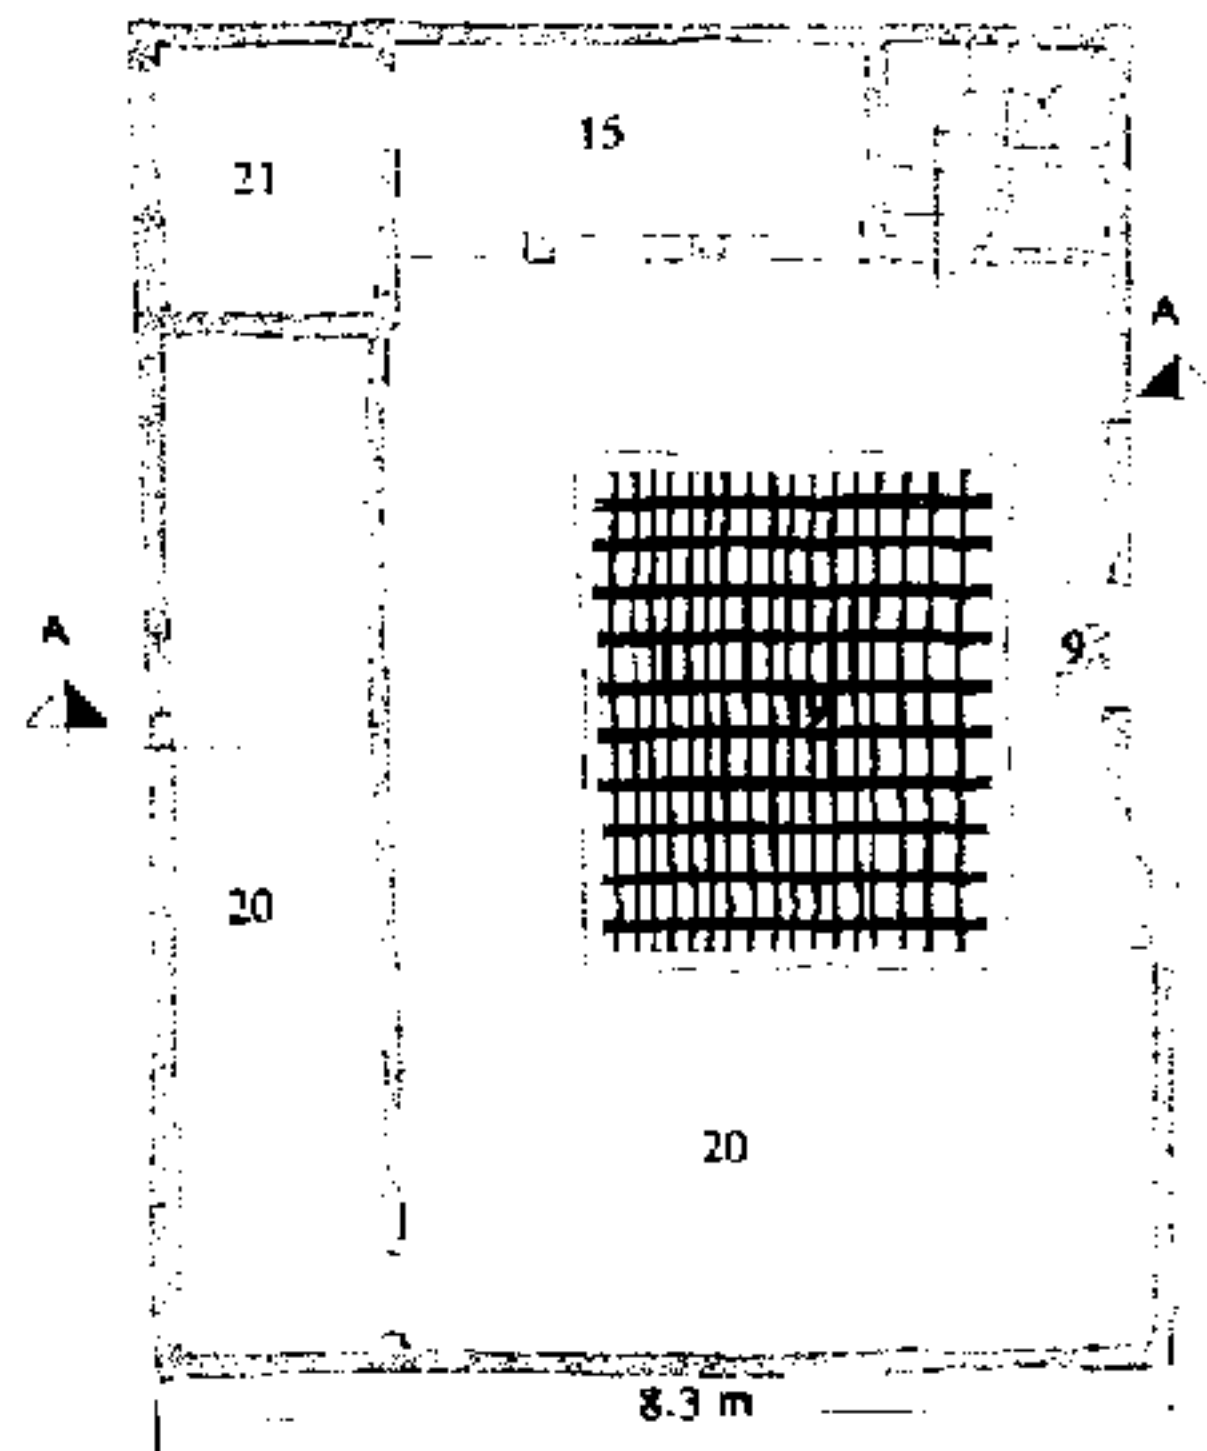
Roof plan of a typical Mزاب's dwelling. Legend: 20. Roof (*Stah*), 21. Room for wood stock.
